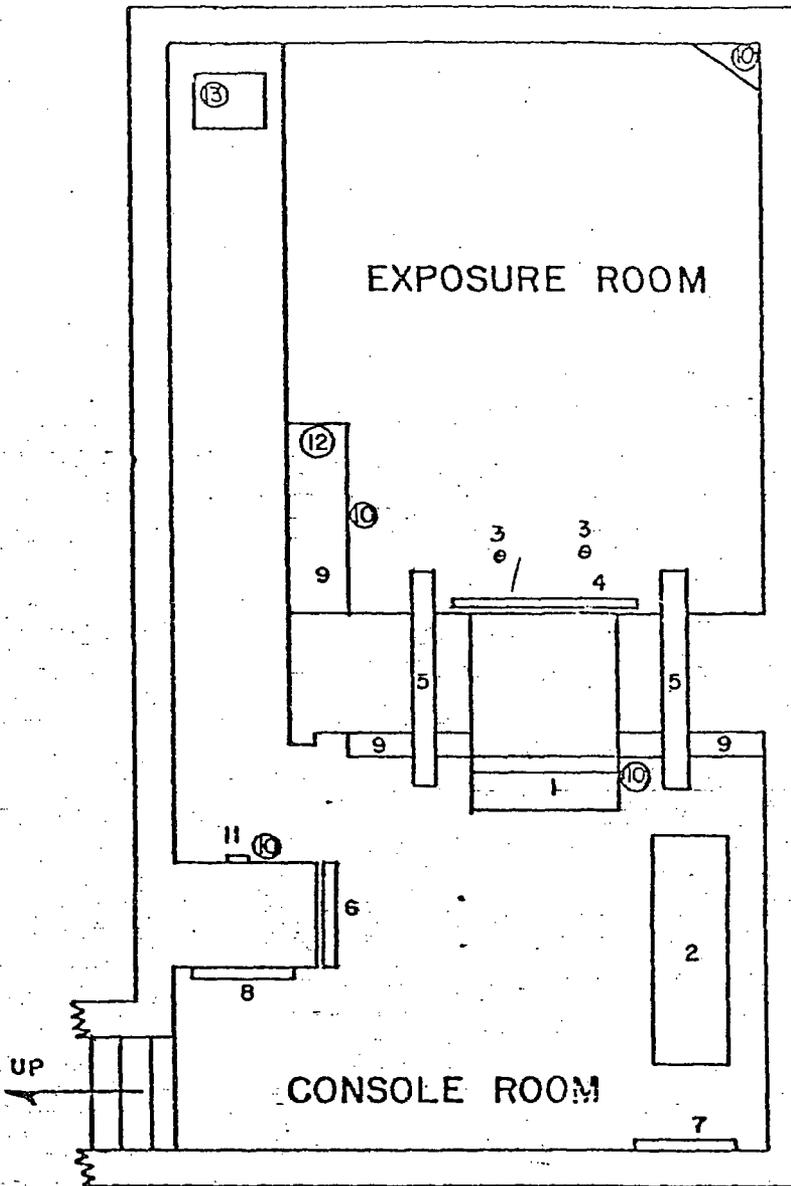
ELEVATION VIEW UNDERGROUND VALT
